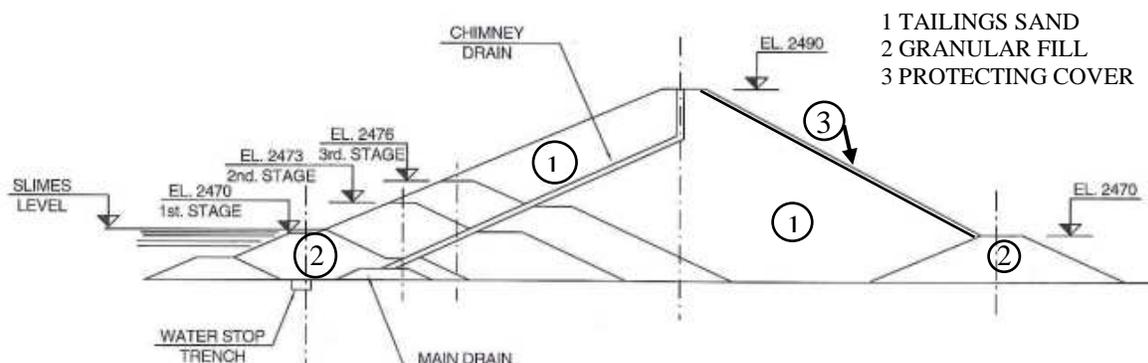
Cross Section of Talabre tailings dam (West dam embankment)
